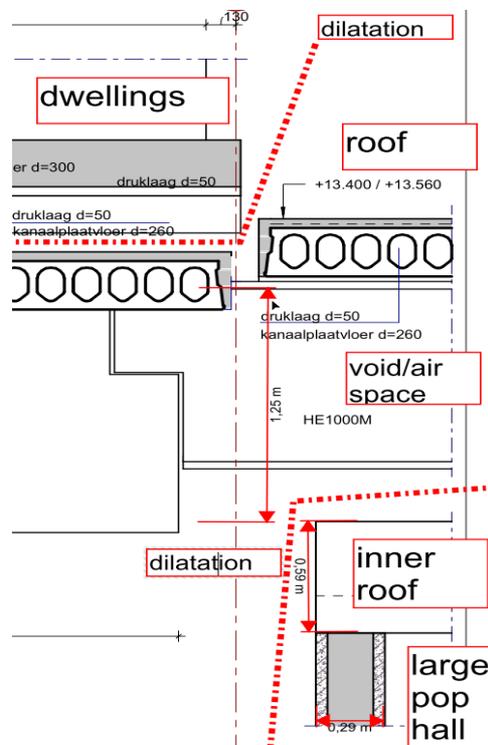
Detail of structural cross-section (side large pophall towards dwellings)
